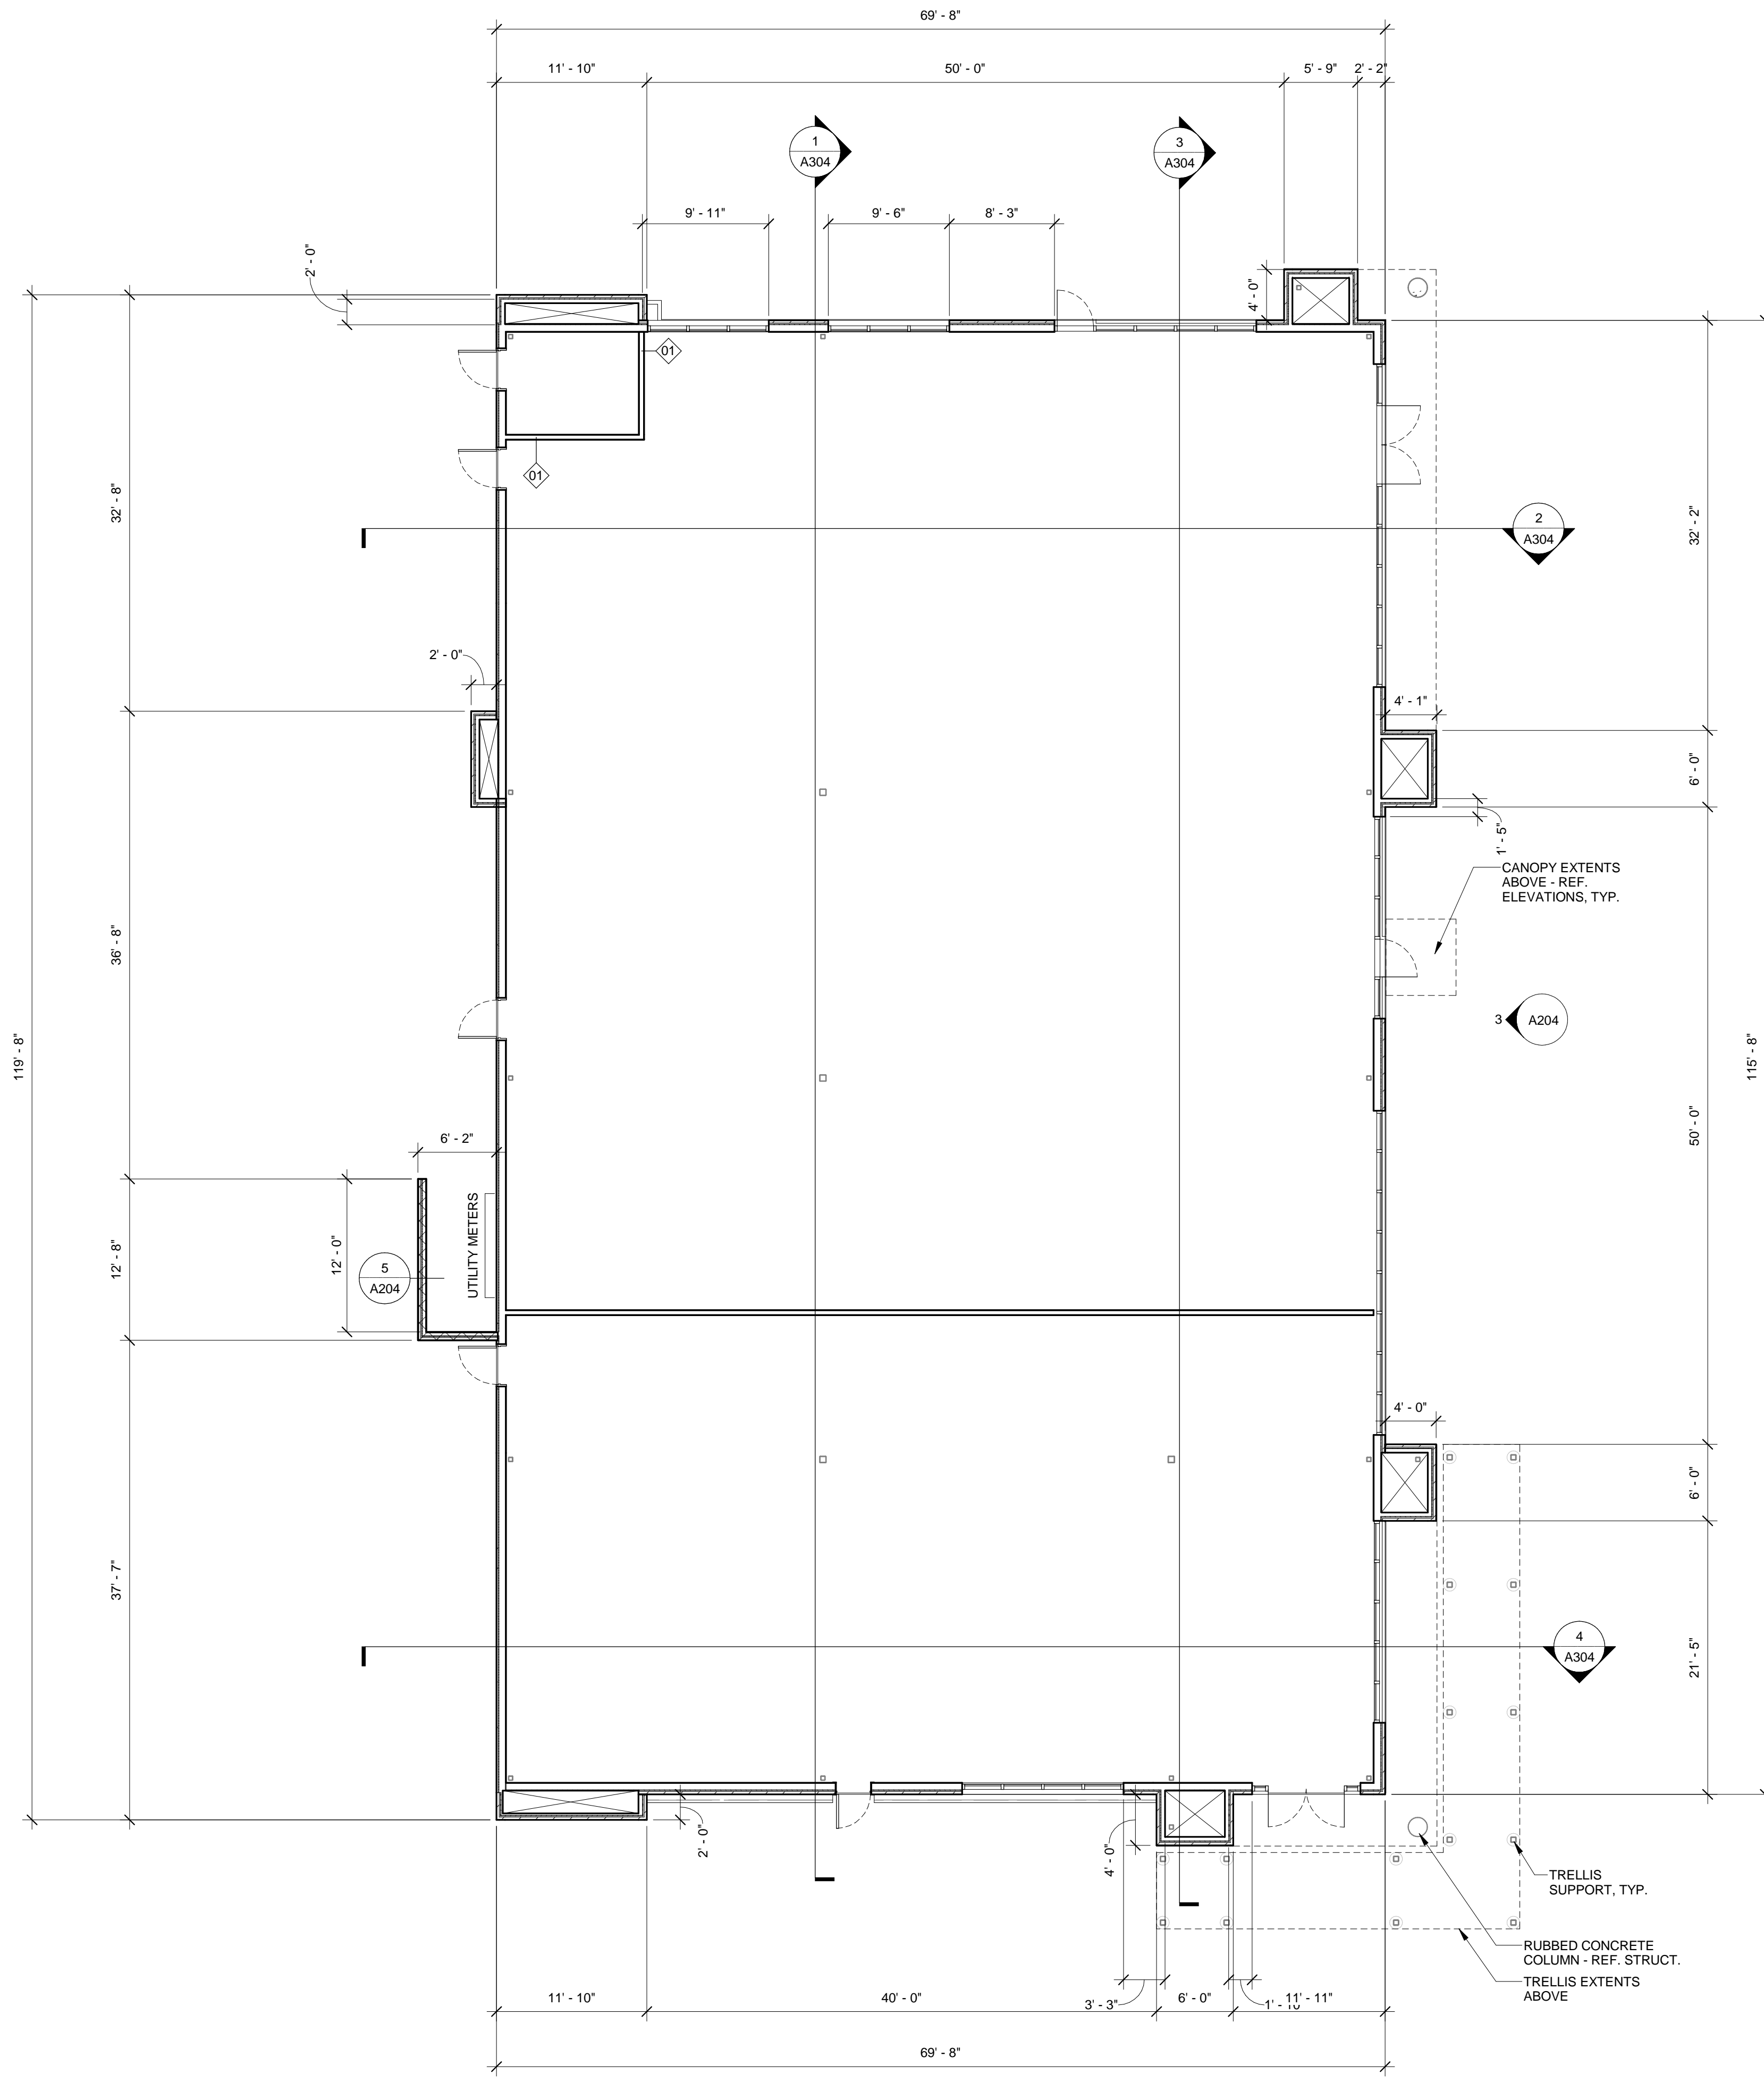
FLOOR PLAN - RETAIL B
